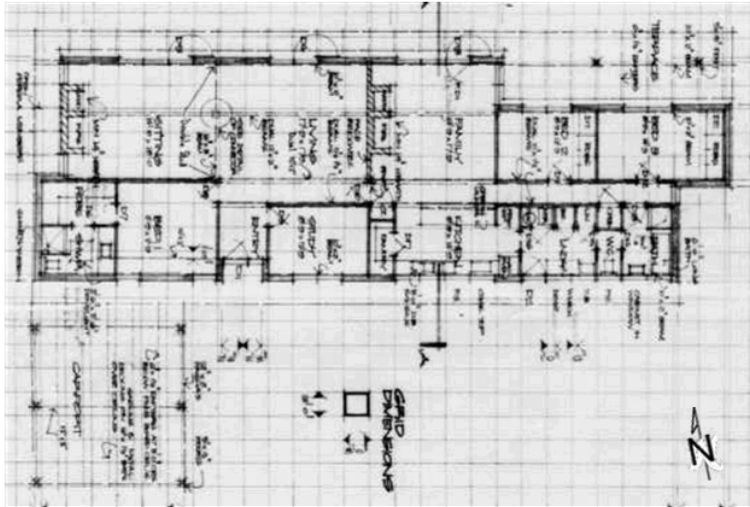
Floorplan of the house and garage, dated November 1972 (FCC BP).
